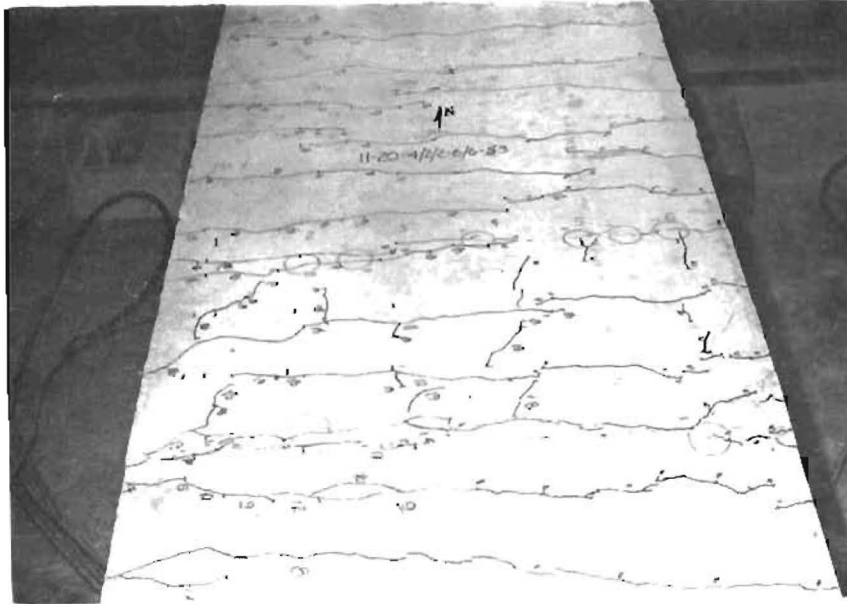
Tension face of 11-20-4/2/2-6/6-S3 after failure
